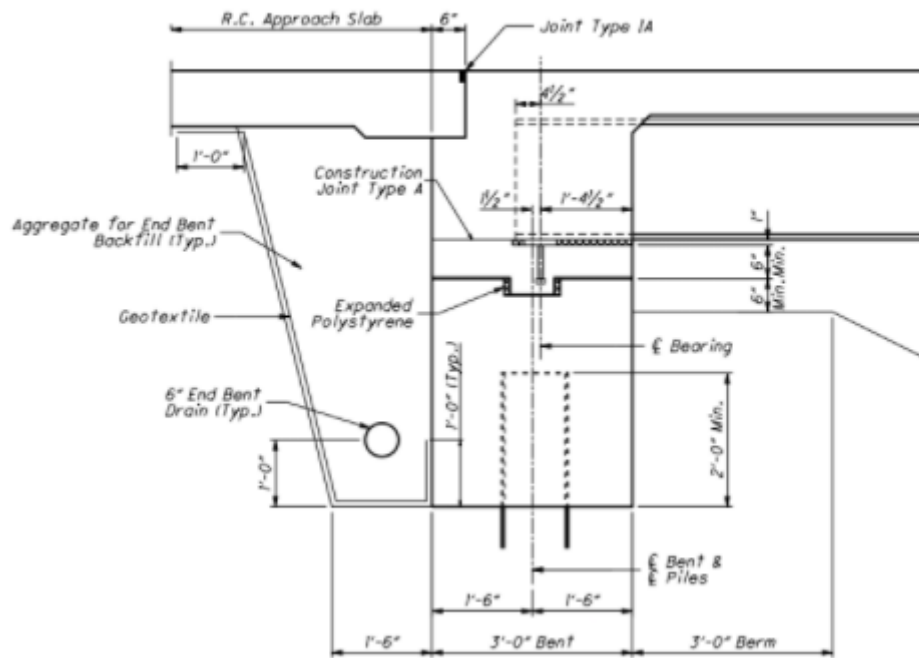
Abutment Detail of the Bridge (NBI 50340) (2009)
